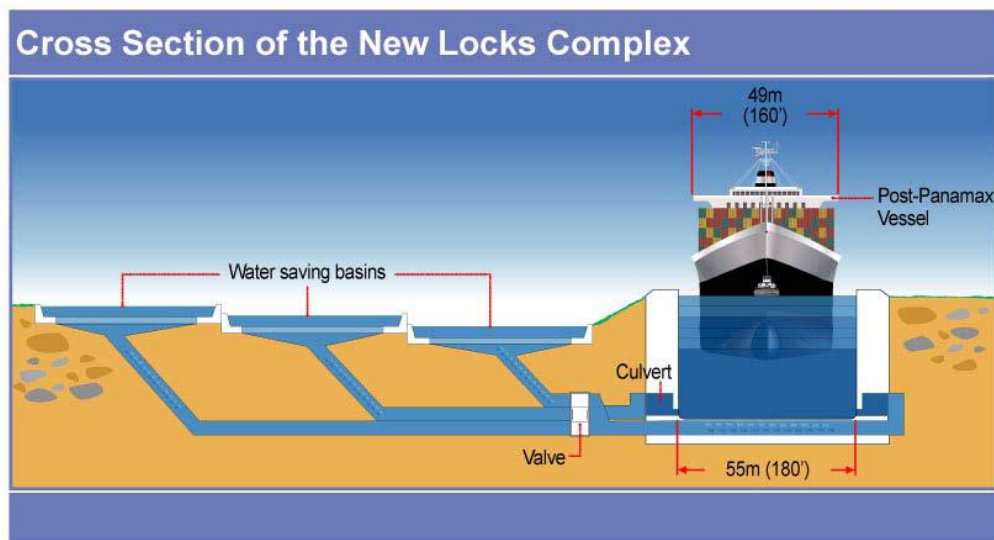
Cross section of the new locks and their water reutilization basins (Panama Canal Authority, 2006)
